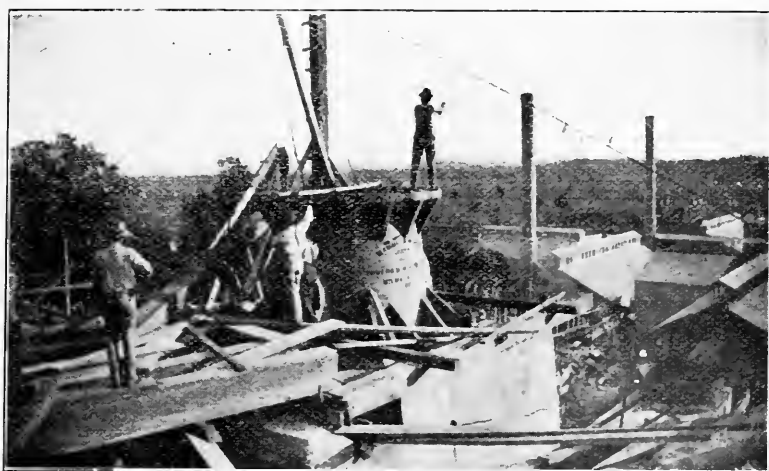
VIEW SHOWING BOTTOM SHELL IN POSITION. WEIGHT 75,470 LBS.
